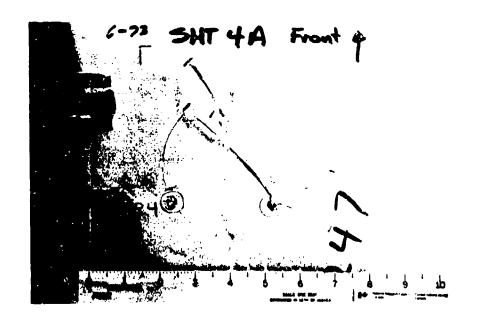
TESTS 36 TO 39 - PANEL P1 - PART II
